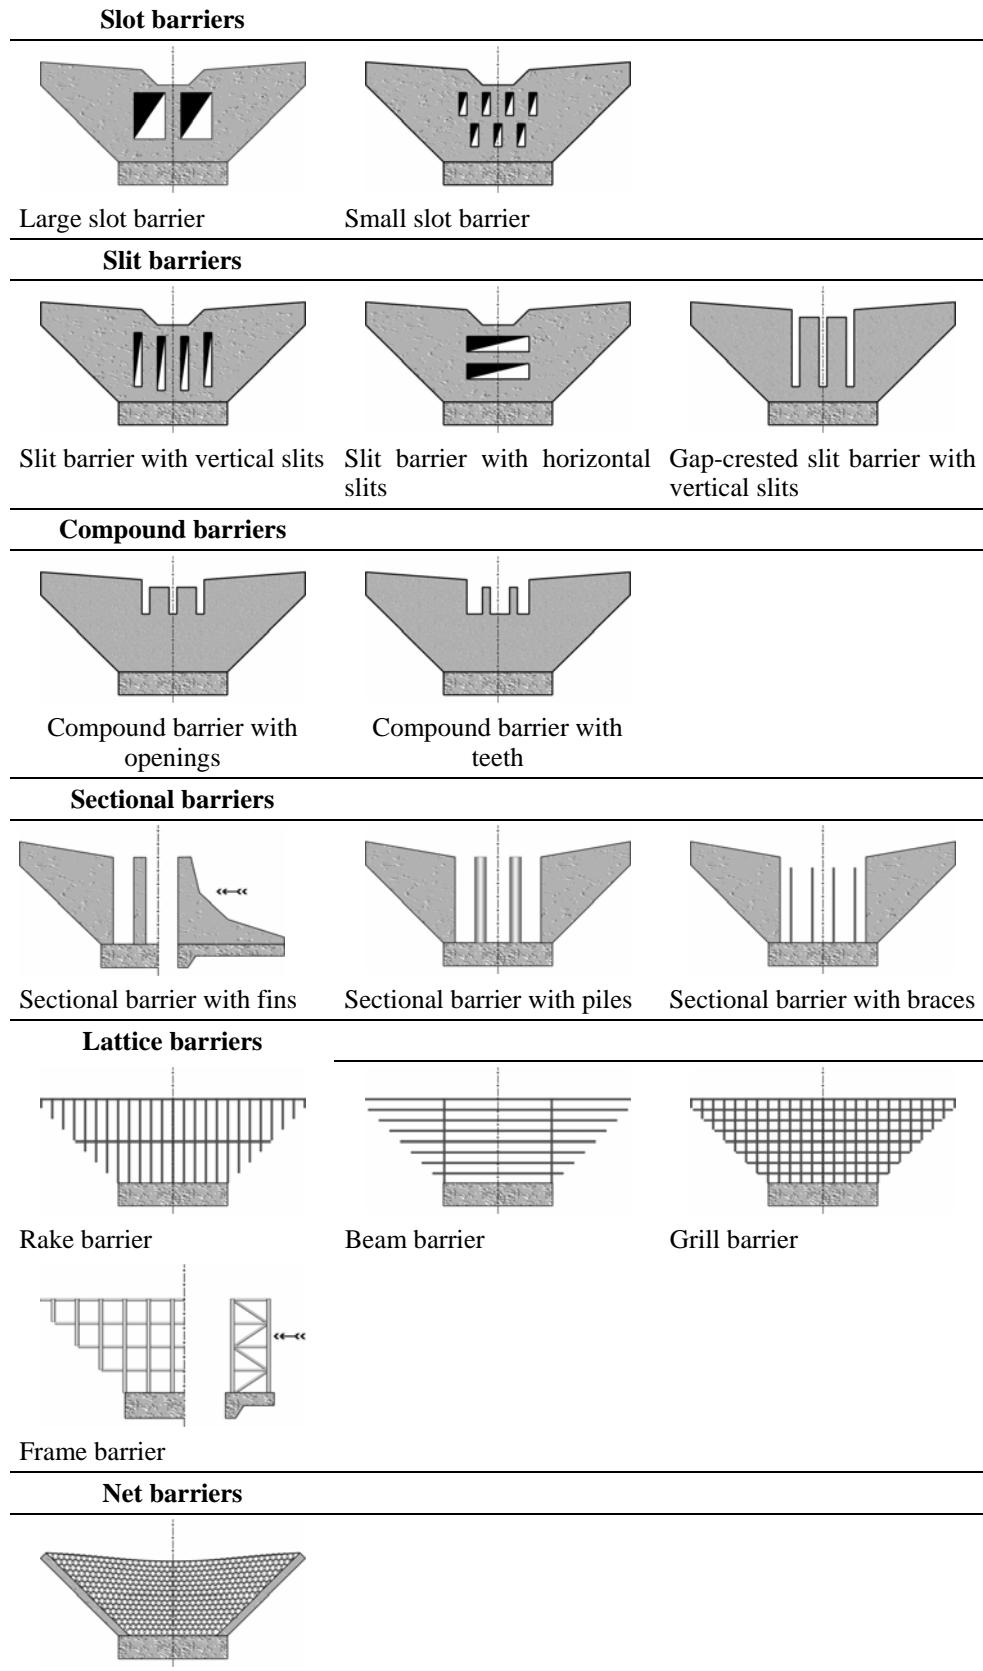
Construction types of open barriers (HÜBL et al., 2003)
